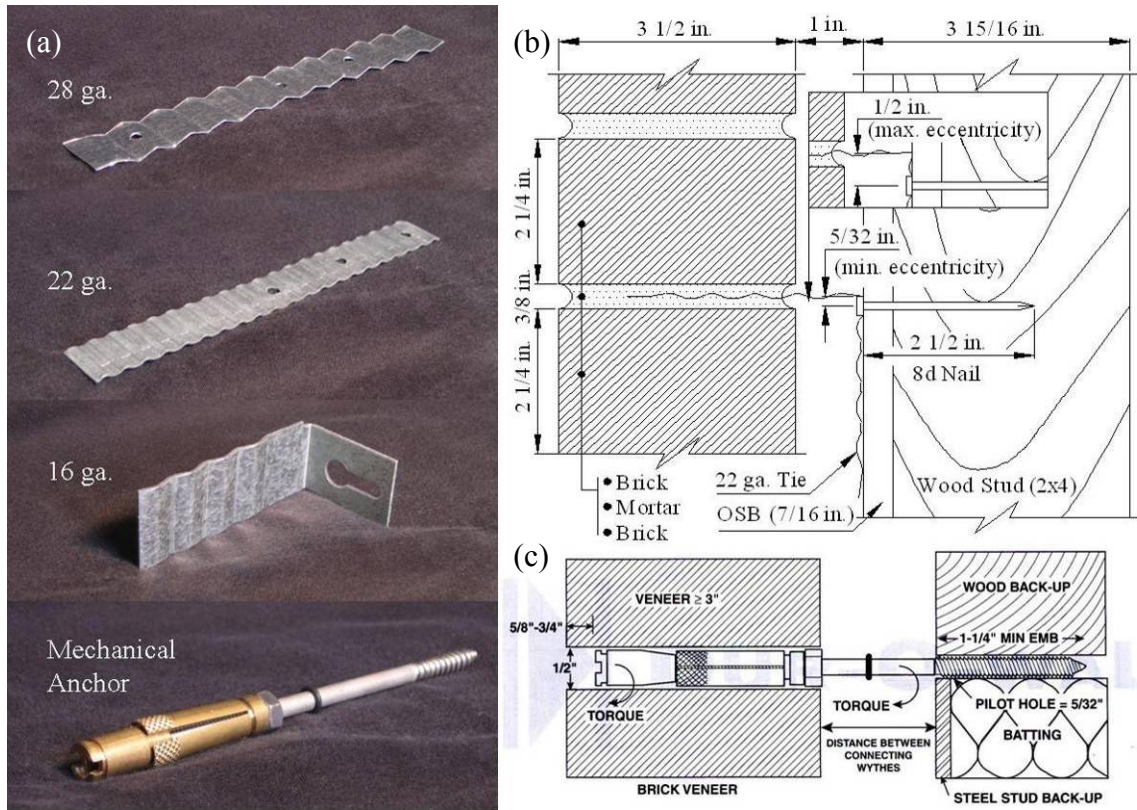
Residential brick veneer wall connectors: (a) corrugated sheet metal ties of three different thicknesses and Series 5300 Dur-O-Wal mechanical repair anchor; (b) tie connection installation details meeting the MSJC (2008) code requirements; and (c) mechanical repair anchor installation details (Dur-O-Wal 1998).
